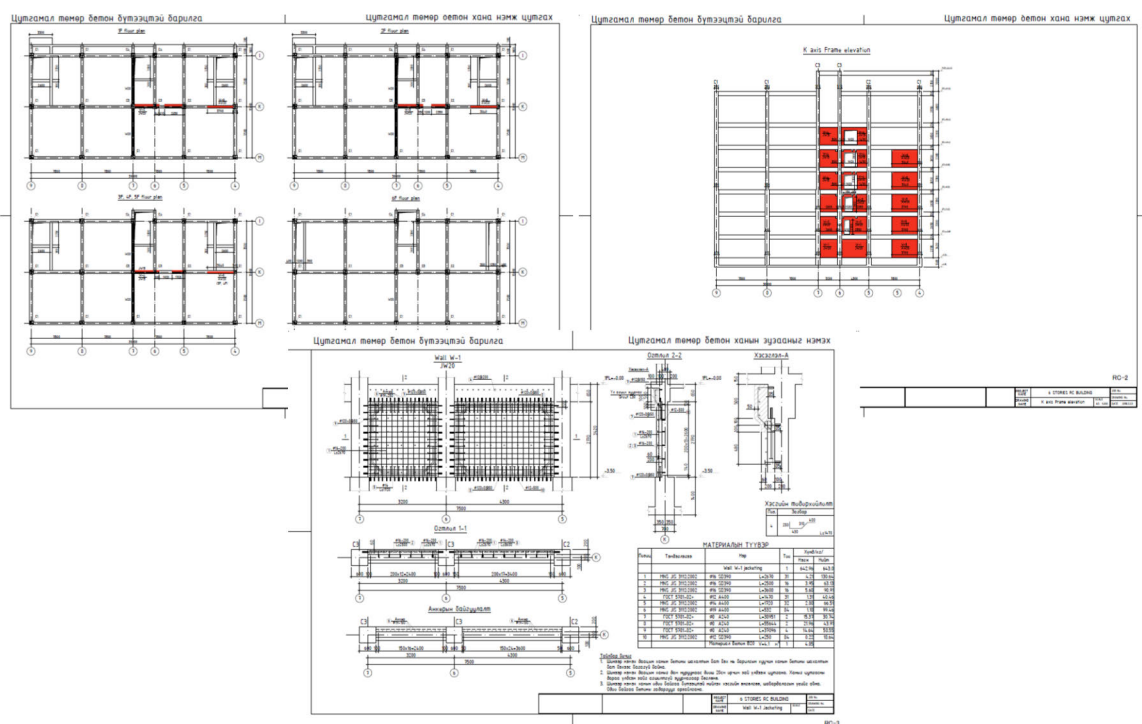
Example of Strengthening the RC building by Additional RC Walls
